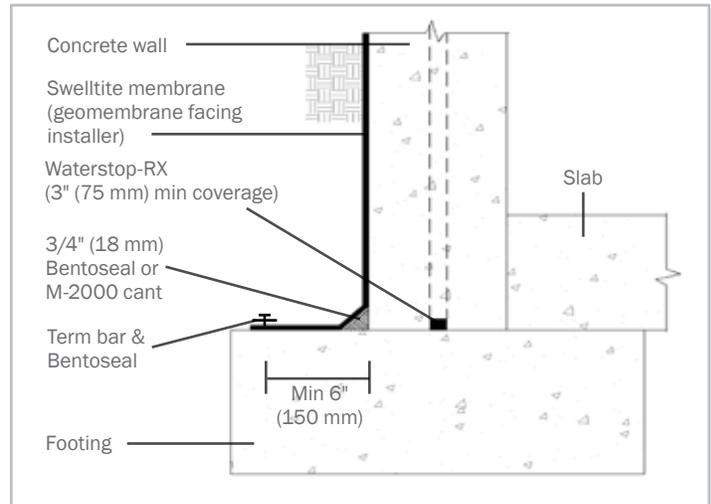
Concrete wall/footing joint (non-hydrostatic)
